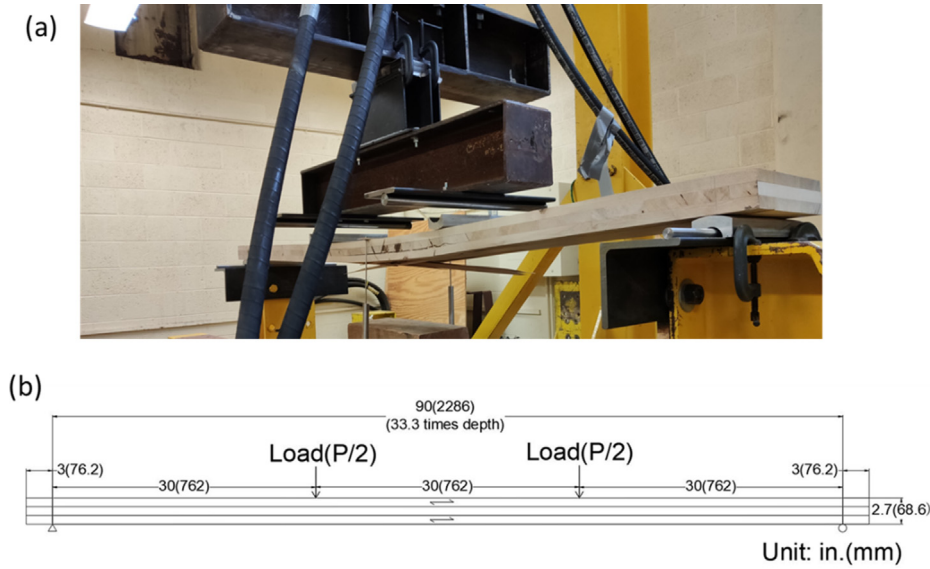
Long-span flexural test setup. (a) loading frame and fixtures; (b) dimension of the long span samples.
